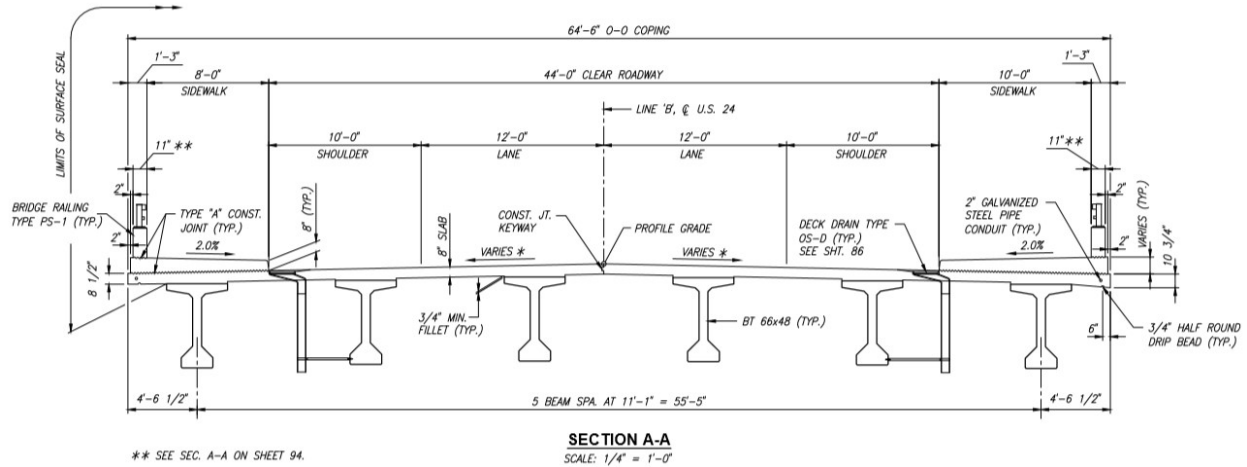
Typical Section of Bridge (NBI 5941) (2014)
